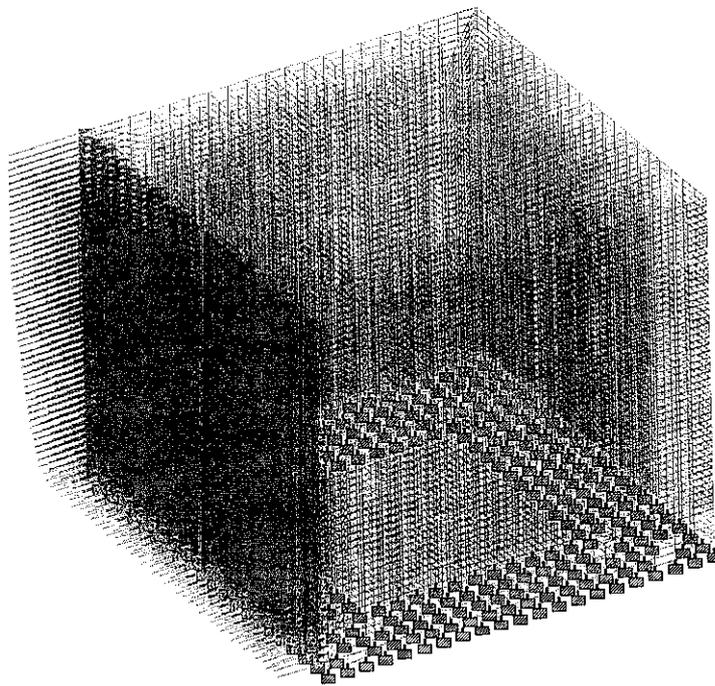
3-D of the Structure with Wind Loading
